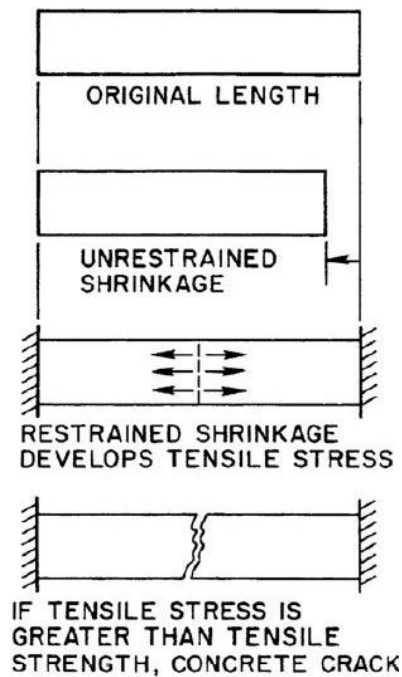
Cracking of concrete due to drying shrinkage (Barth et al., 2001)
